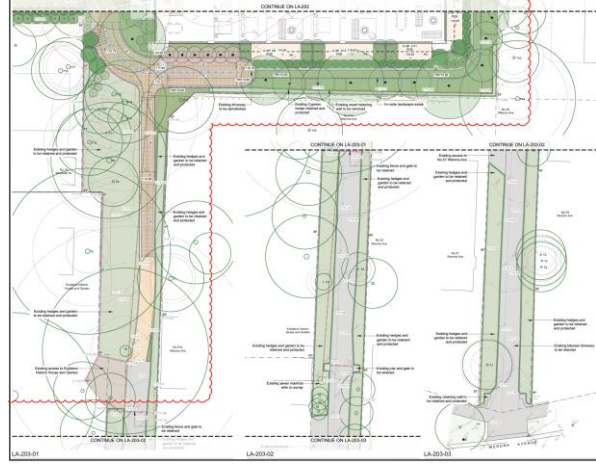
Revised access handle landscape plans (Source: Studio IZ)
